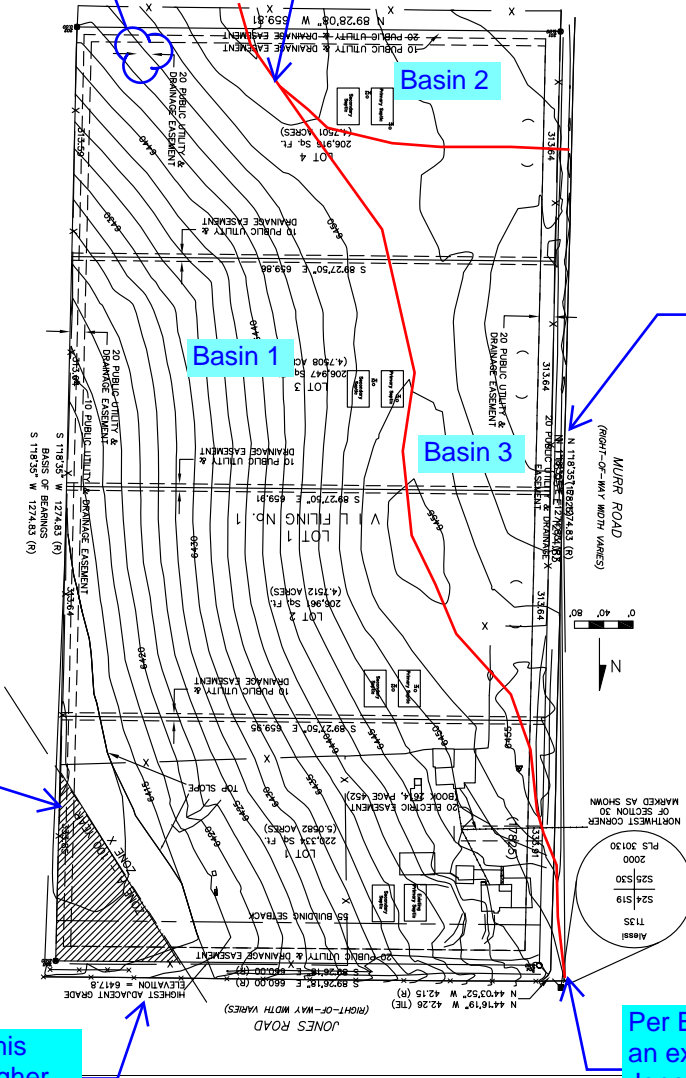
Small plat plan of proposed subdivision. Larger print accompanies this report.
